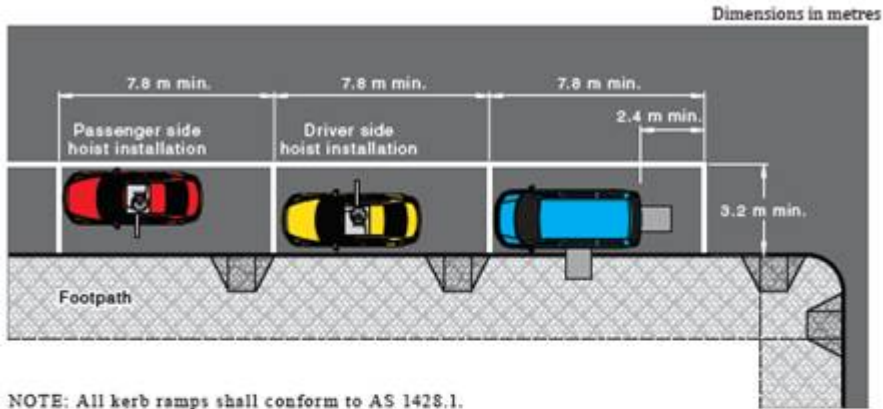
Examples of accessible parallel parking without kerb extensions
